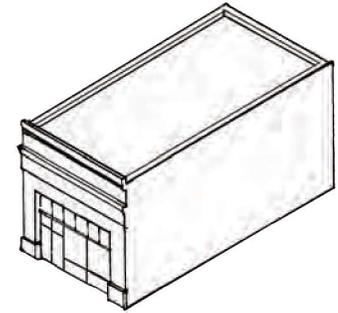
Place an addition at the rear of a building, or set it back from the front, to minimize visual impacts.
